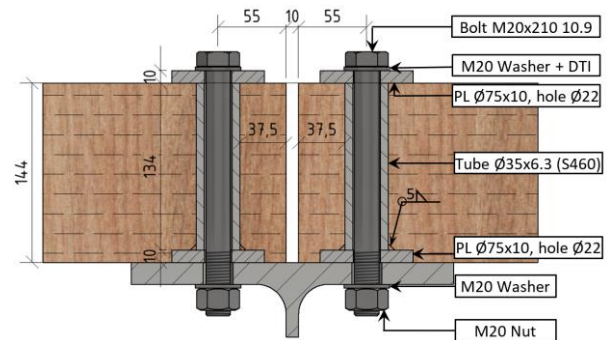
Cross-section details of shear connection type 1 (SCT-1).
